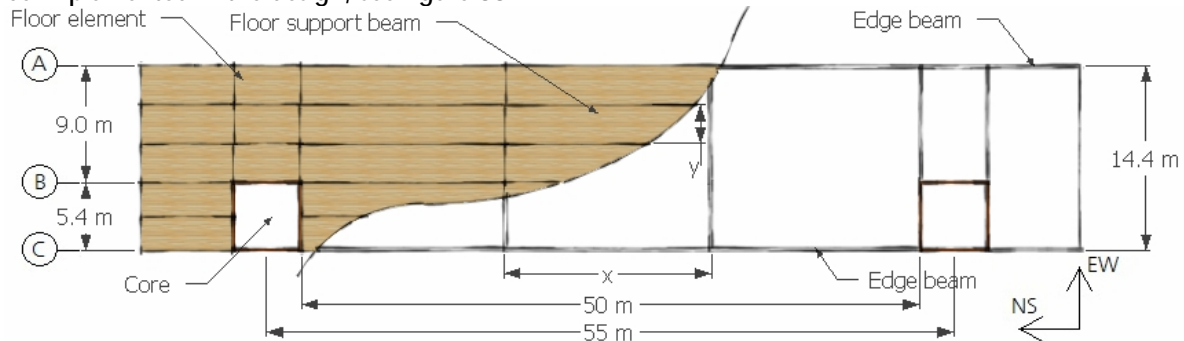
Support beams underneath the floor elements (indicative, not to scale)
